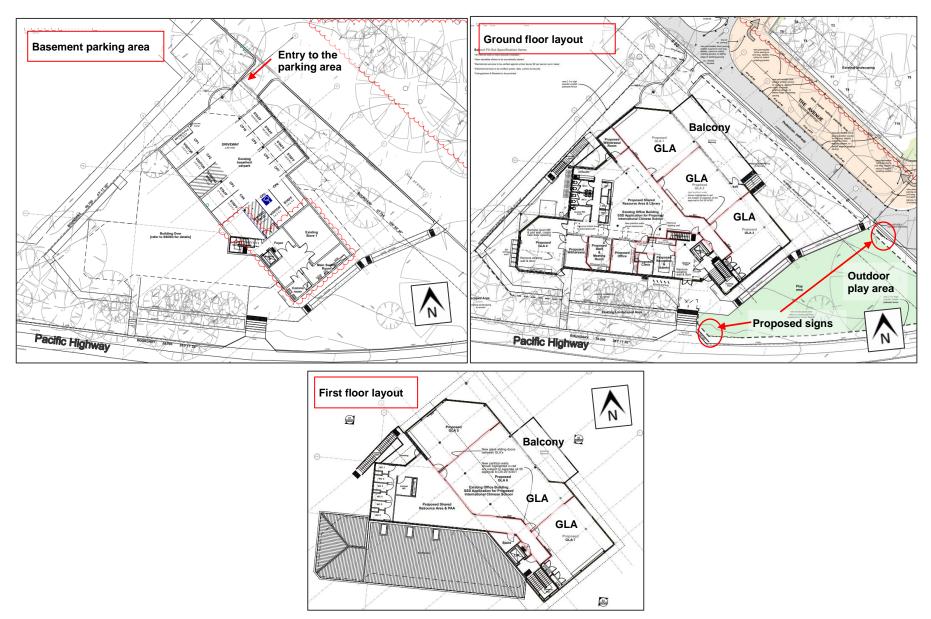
| Floor plans of the existing building and vehicular areas approved by a separate development application (Source: Applicant's SRTS)
